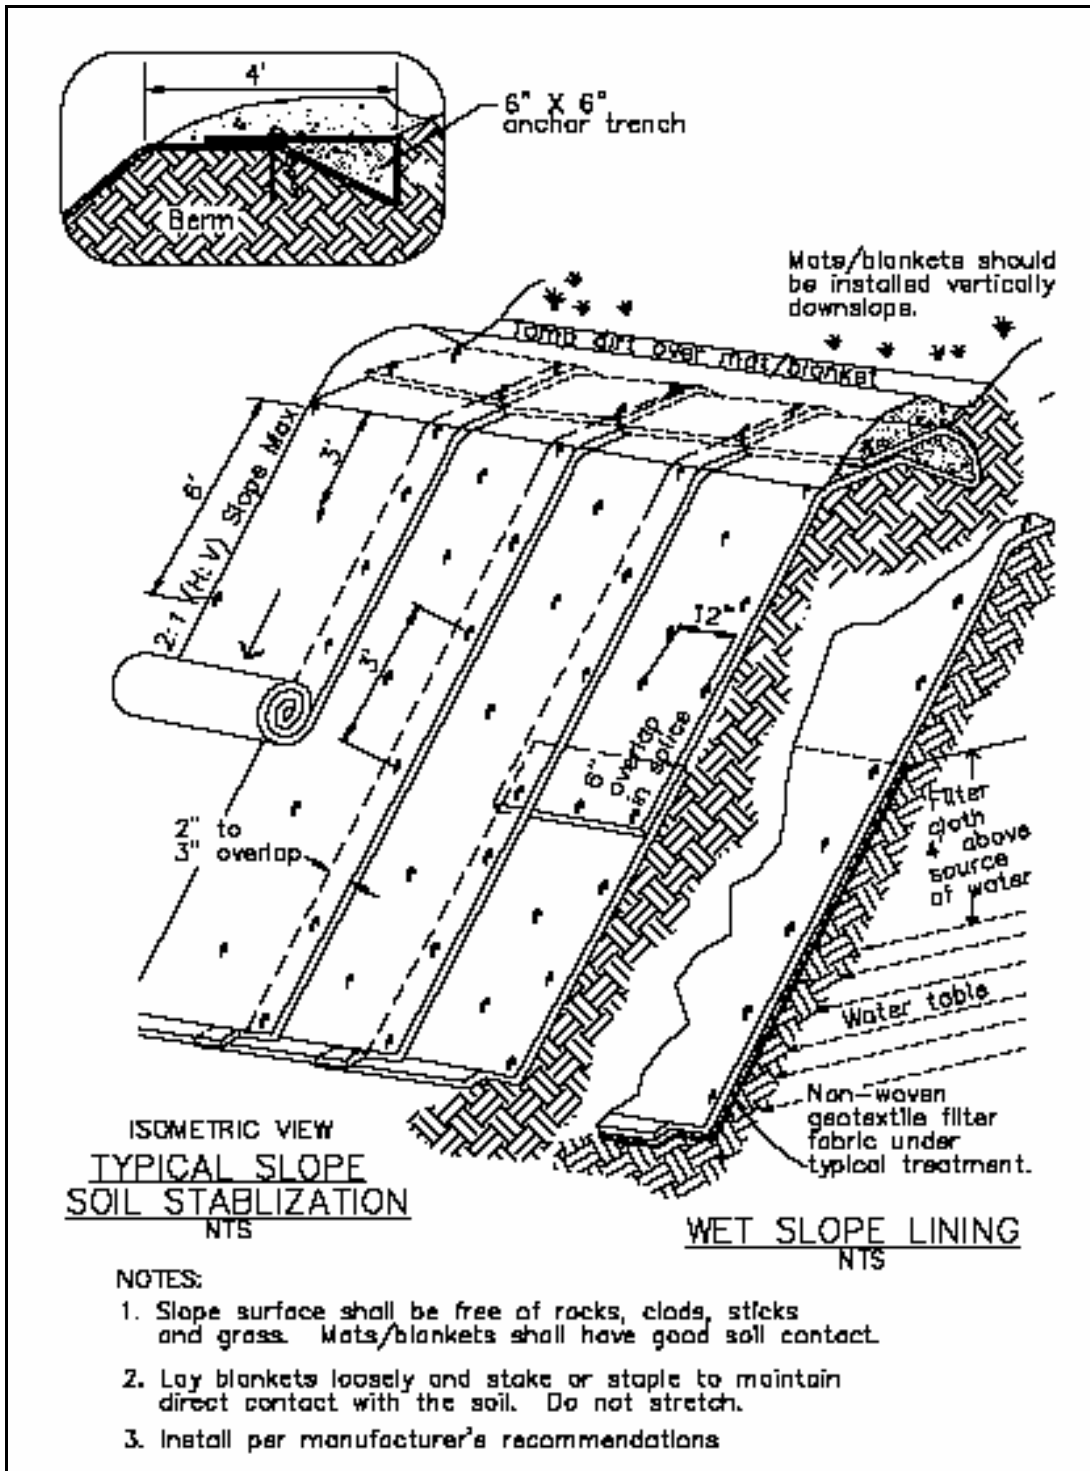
TYPICAL INSTALLATION DETAIL
